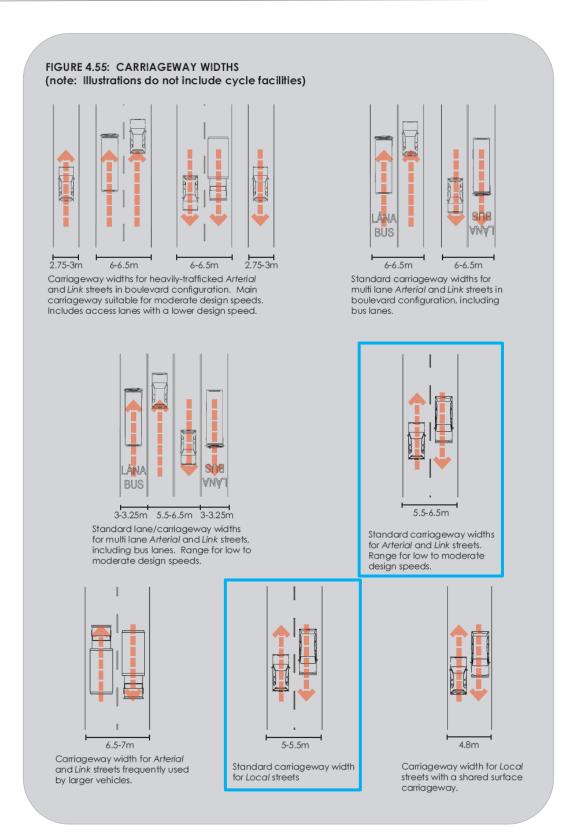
Carriageway Widths (source: Design Manual for Urban Roads and Streets)
